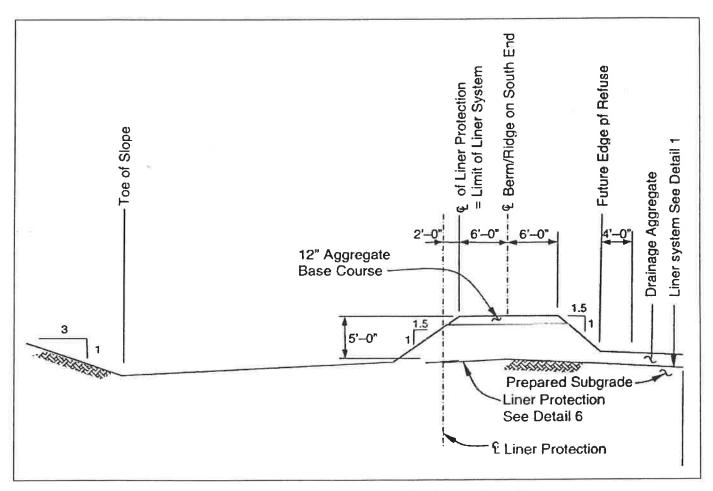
Detail 4 - Interim Liner System Termination (North Side)
